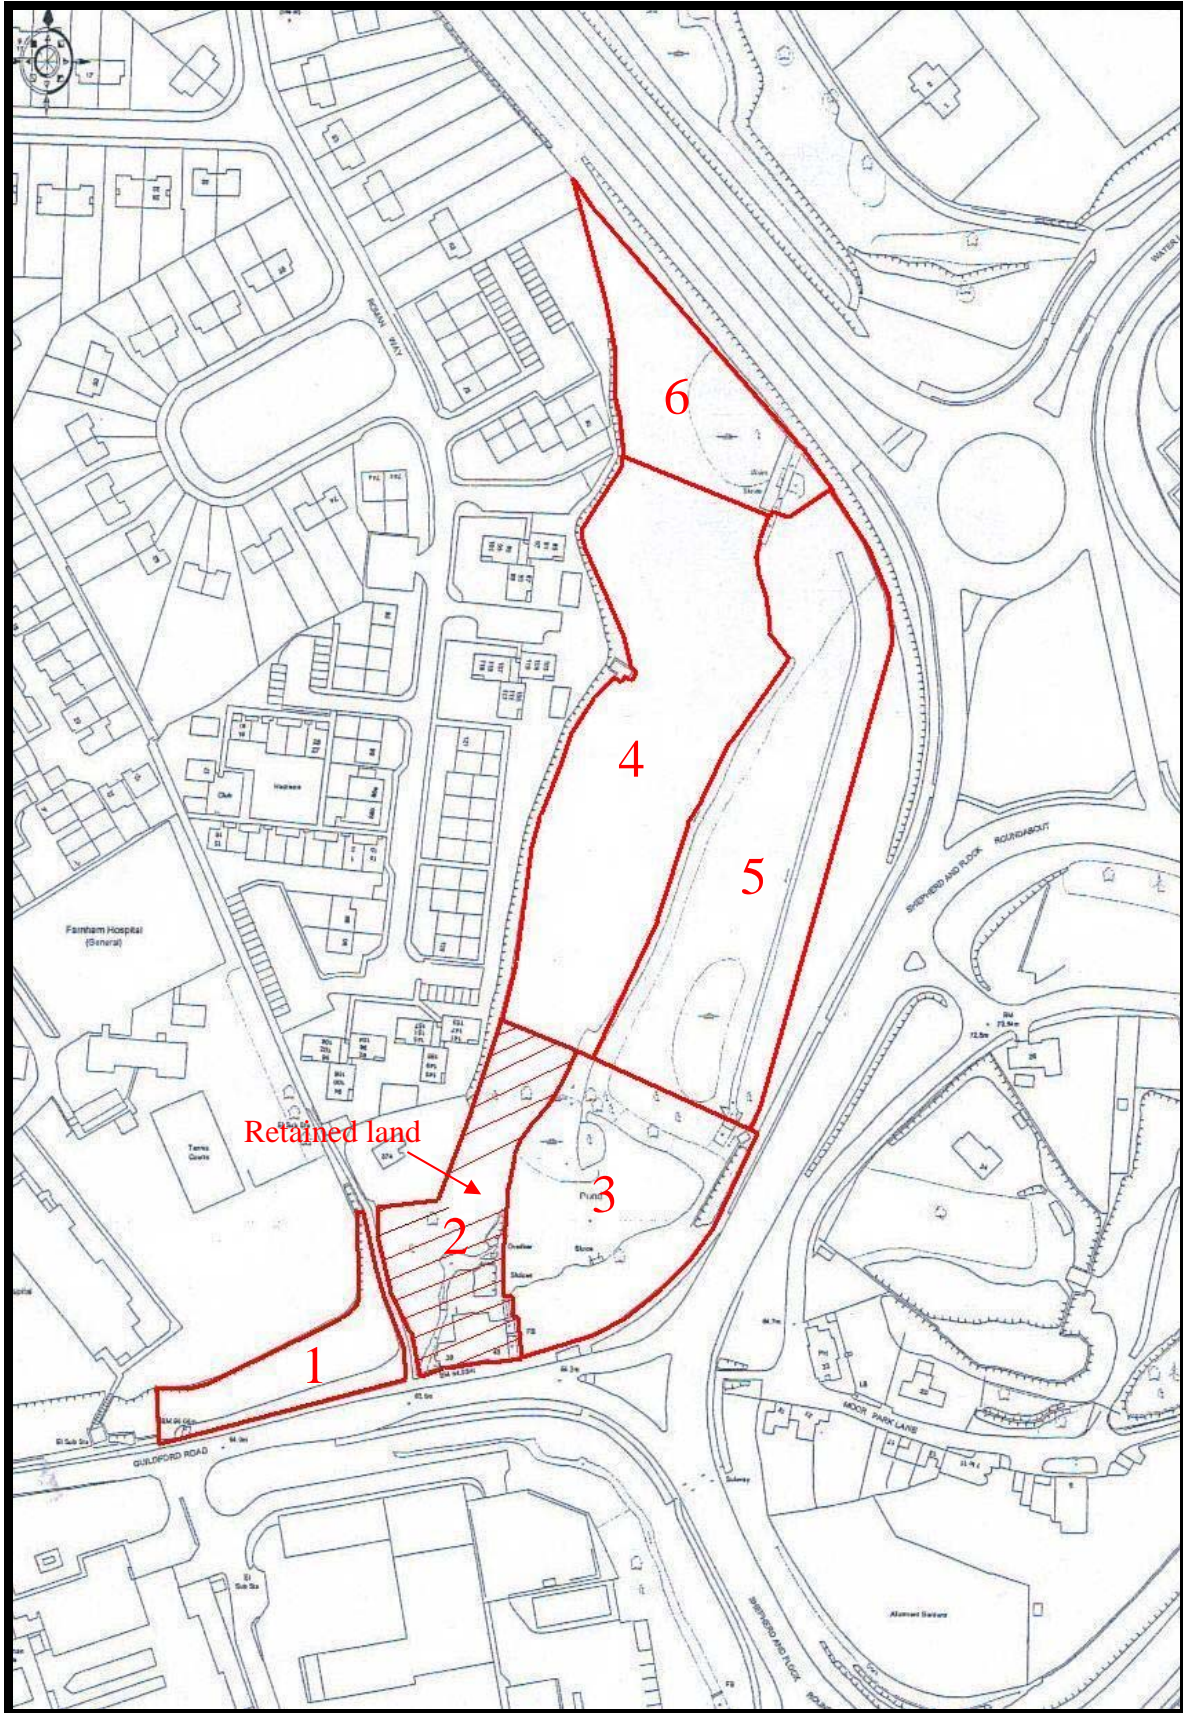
Existing Site Plan Showing Site Sub-Divisions
